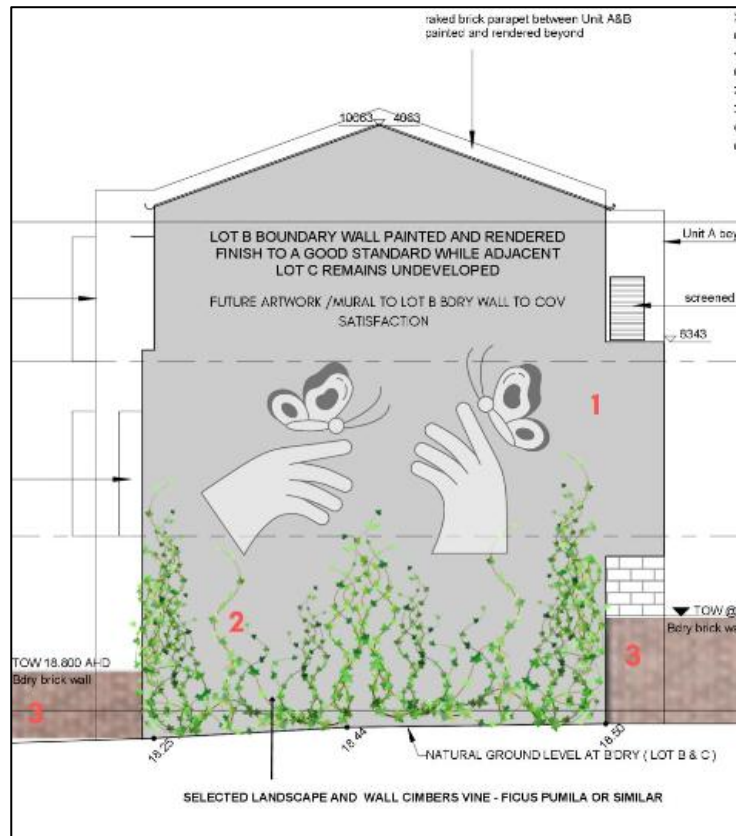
Demonstration of extent of artwork and proposed creeper landscaping for Lot B's wall
